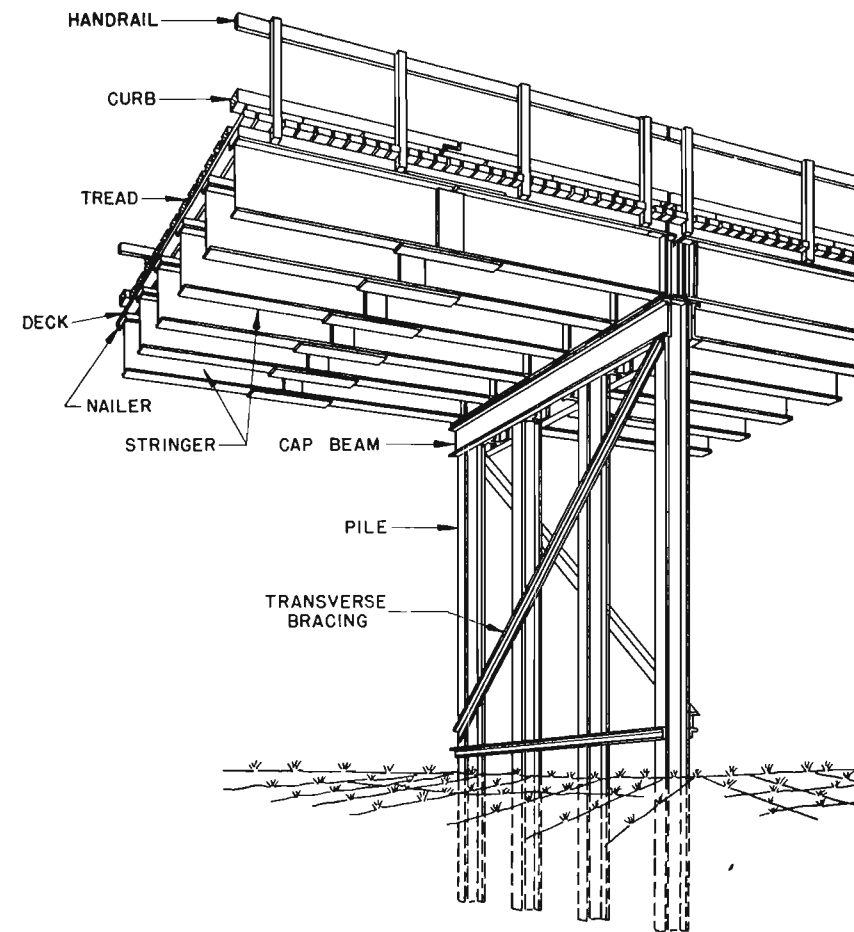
Highway bridge, class 50, double-lane, steel stringers on steel pile bent; class 25 similar except 3 piles in bent.
